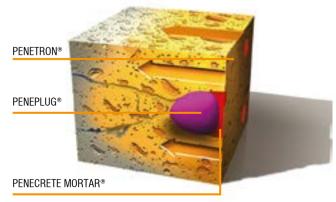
shows how PENETRON® not only stops leaks at the plug point, but continues to force crystals deeper into the crack and surrounding concrete, forming a complete seal.
